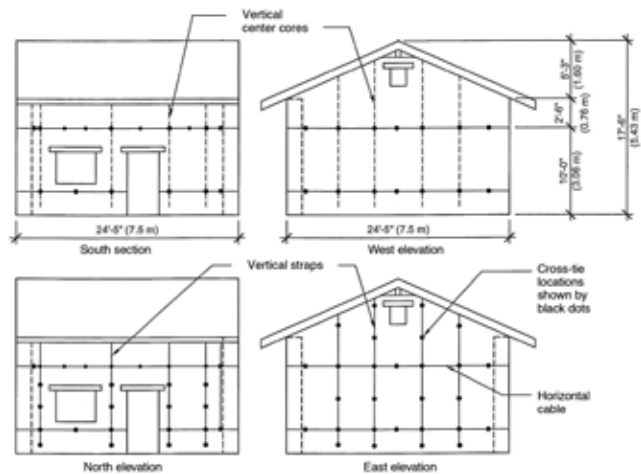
Wall elevations of model 9, with vertical straps on the north and east walls and center core rods on the south and west walls. Note that dimensions are prototype dimensions.
